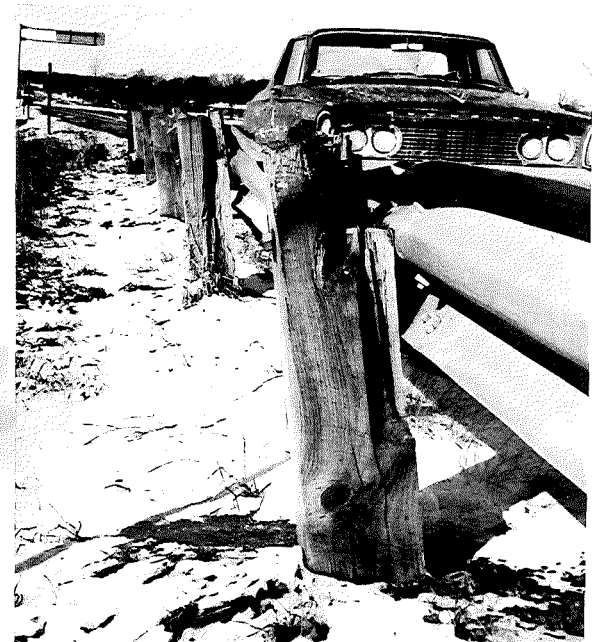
View looking east at I 96 culvert construction area. Sample 63 MR-287 was obtained when permanent guard rail from ramp in background was partially relocated as temporary rail in foreground.
